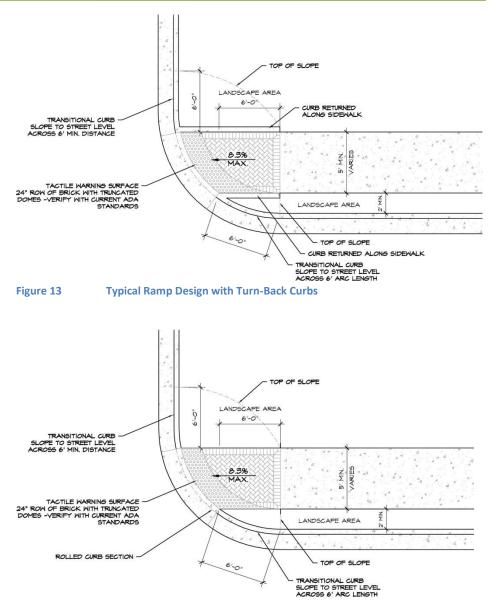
Typical Ramp Design Alternative w/out Turned Back Curbs
